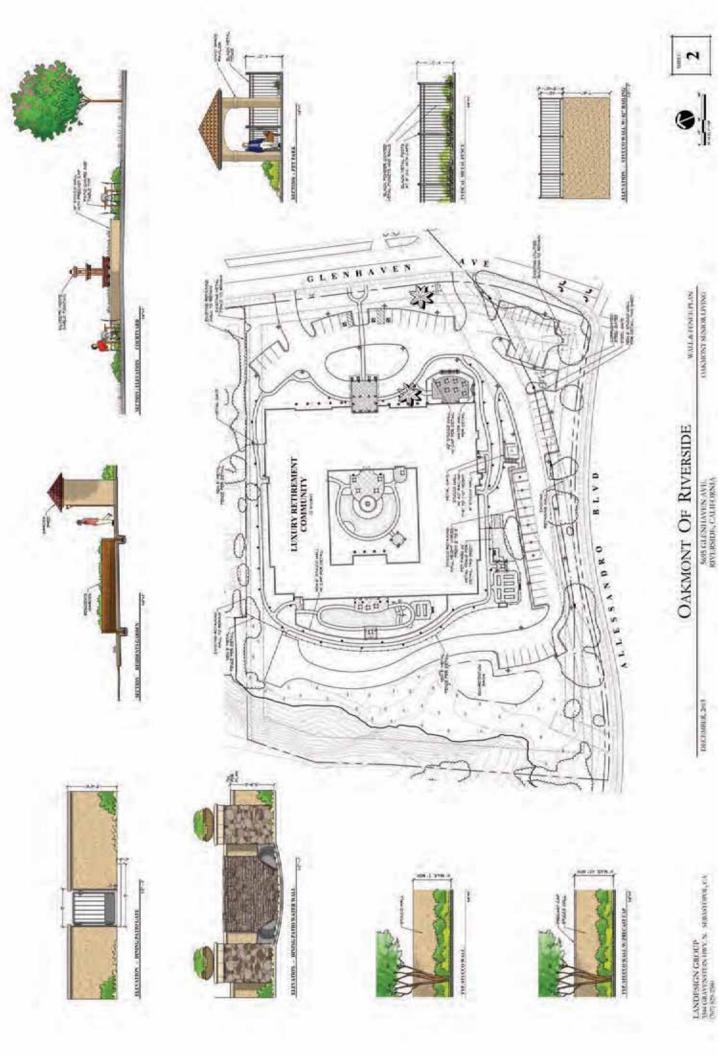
P15-0610 & P15-0611, Wall and Fence Plan
